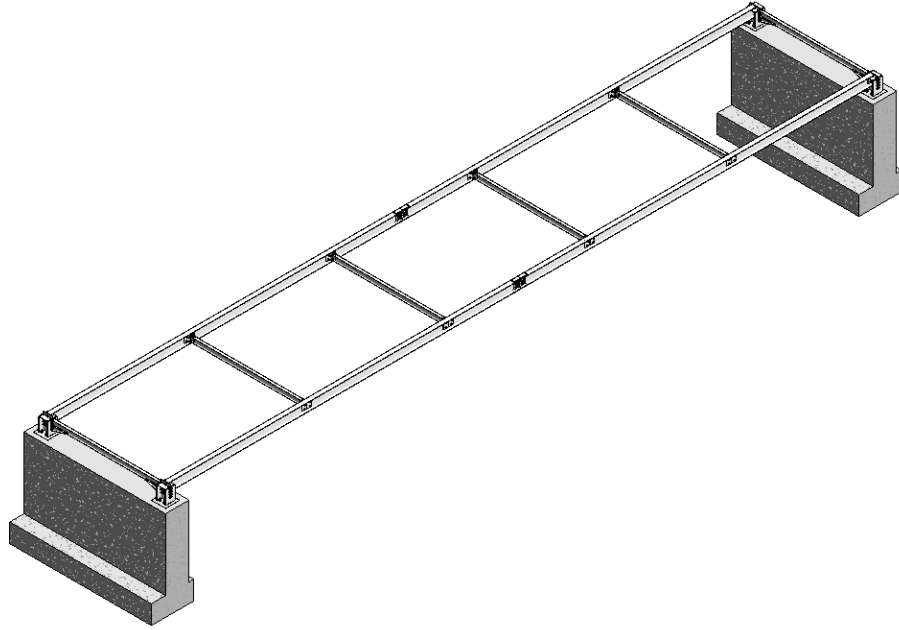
Architectural design 1 (structure) with Revit (3D view)
